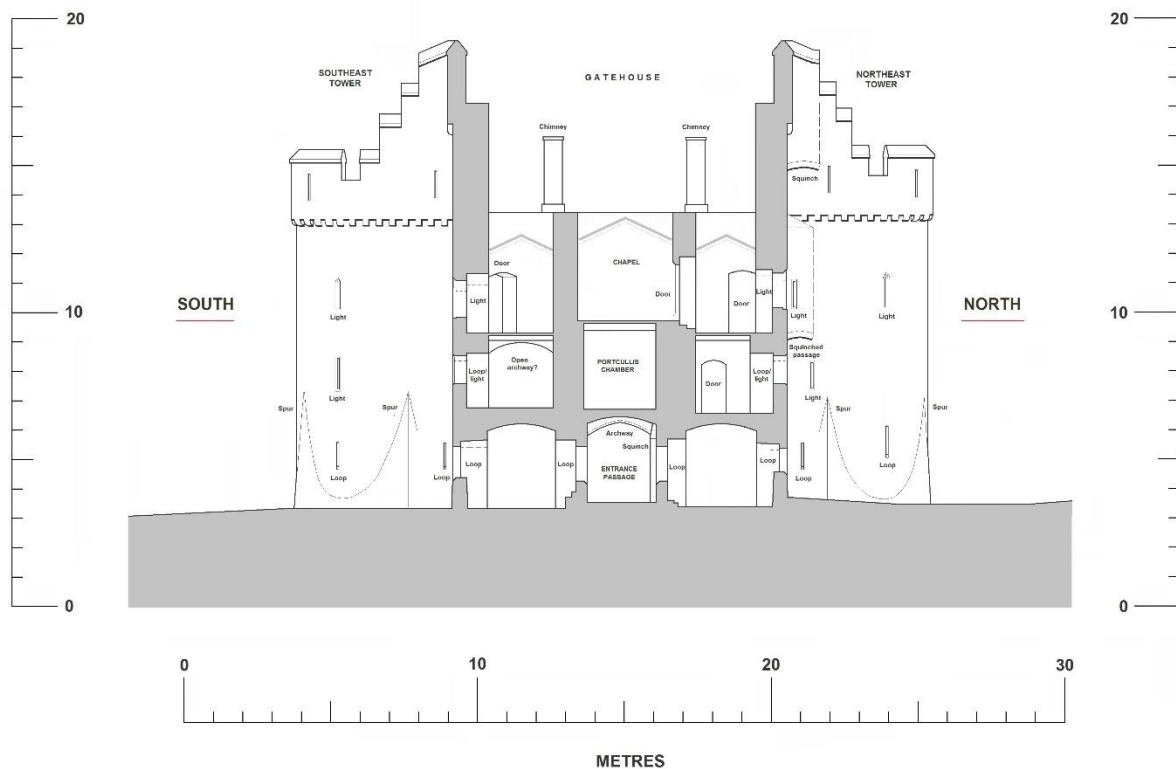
Transverse section through Picton Castle east towers, facing west – modern
